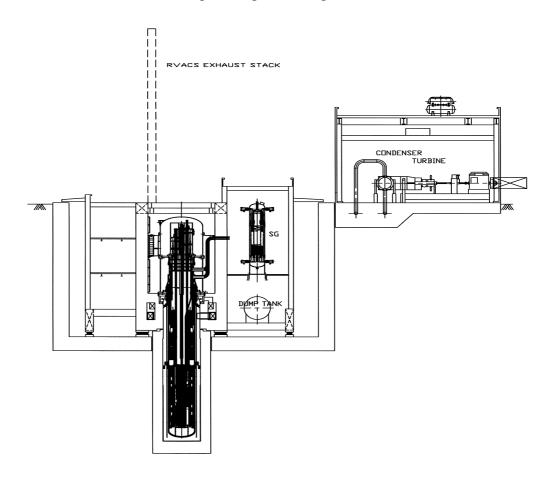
Vertical cross-section of the 4S plant of 10 MW(e).
